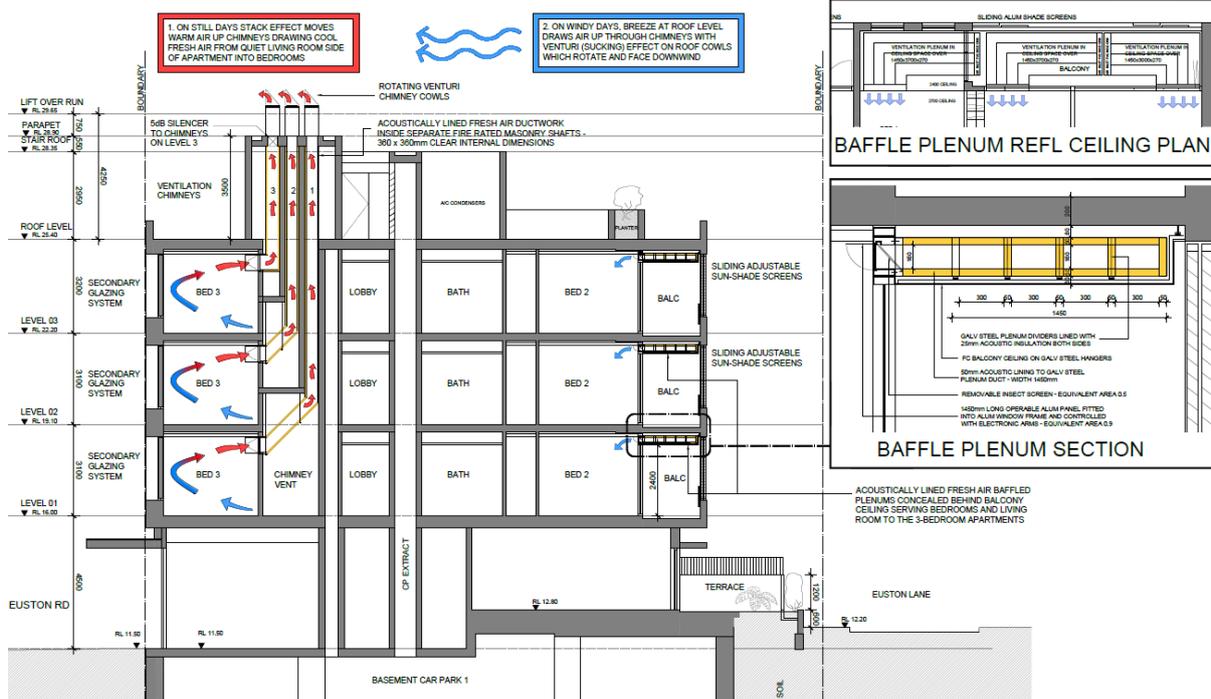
Section extract from the 'Natural Ventilation System' drawing by Carlisle Architects indicating details of the proposed passive natural ventilation plenum and chimney system.
